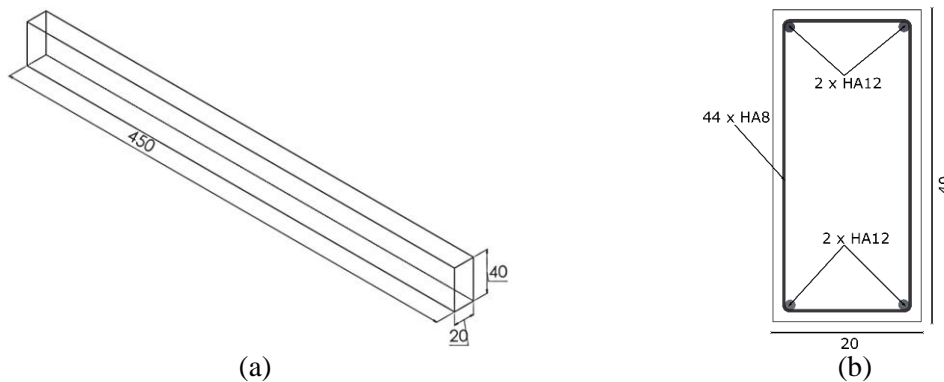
Specimen's design: (a) Geometry, (b) Reinforcement details. - dimensions in centimeters-
